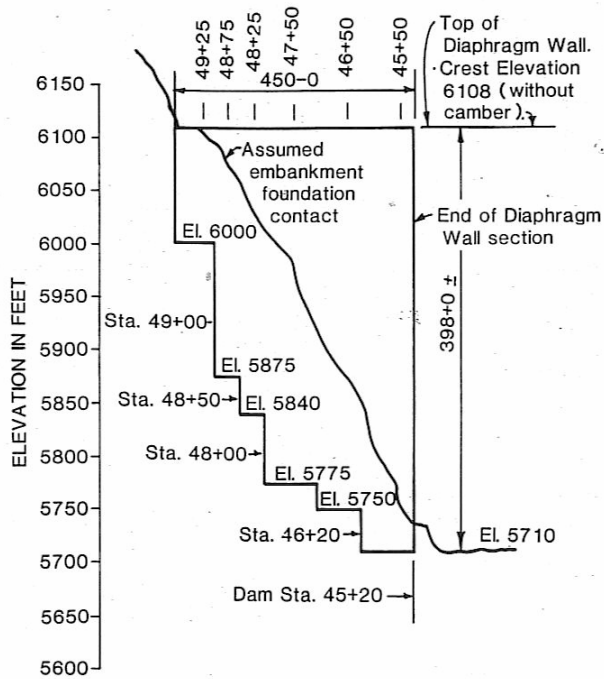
Navajo Dam – Profile of left abutment concrete diaphragm wall (Dewey, 1988).
